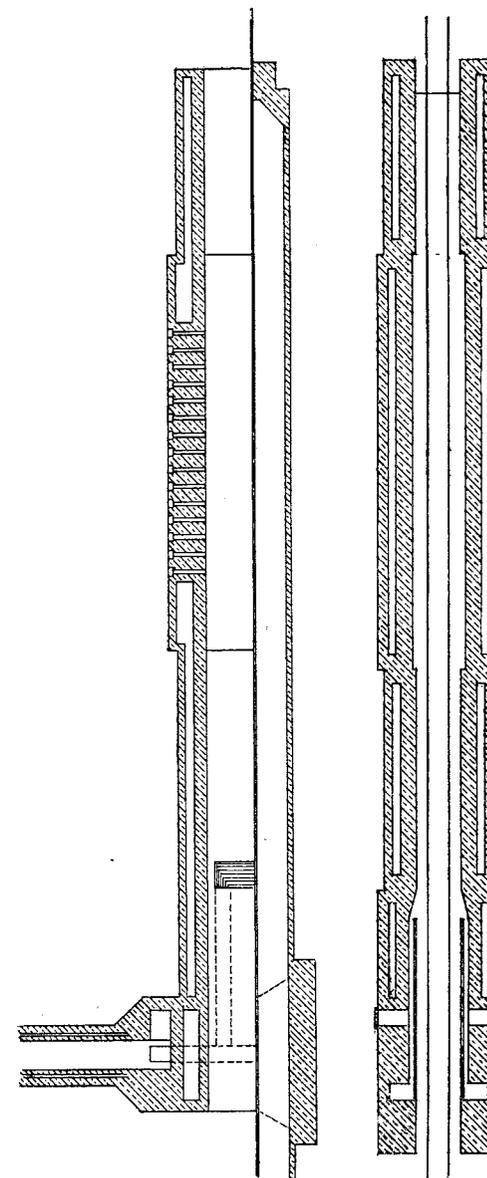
a, b.—Vertical and horizontal sections of Bock kiln—car-tunnel type. (After Lovejoy.)
